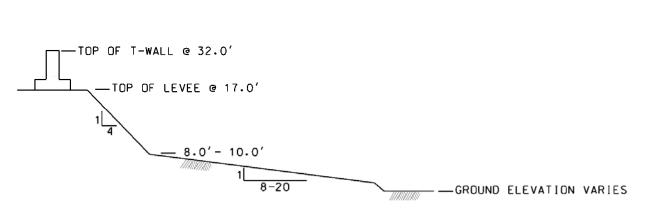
Typical Levee Design Cross-section Caernarvon to Verret Levee/Floodwall Combination (SB16)
